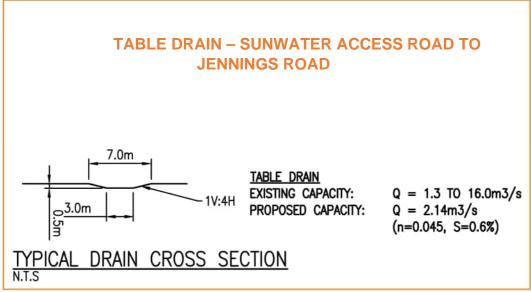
Sunwater Access Road to Jennings Road Table Drain Upgrade
